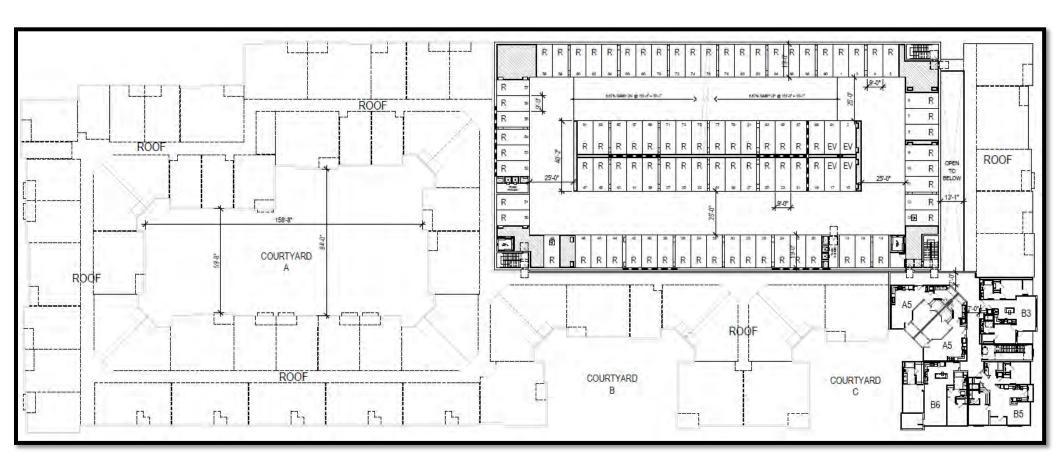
(5): Building Composite Plan – Level 7/Roof Plan
